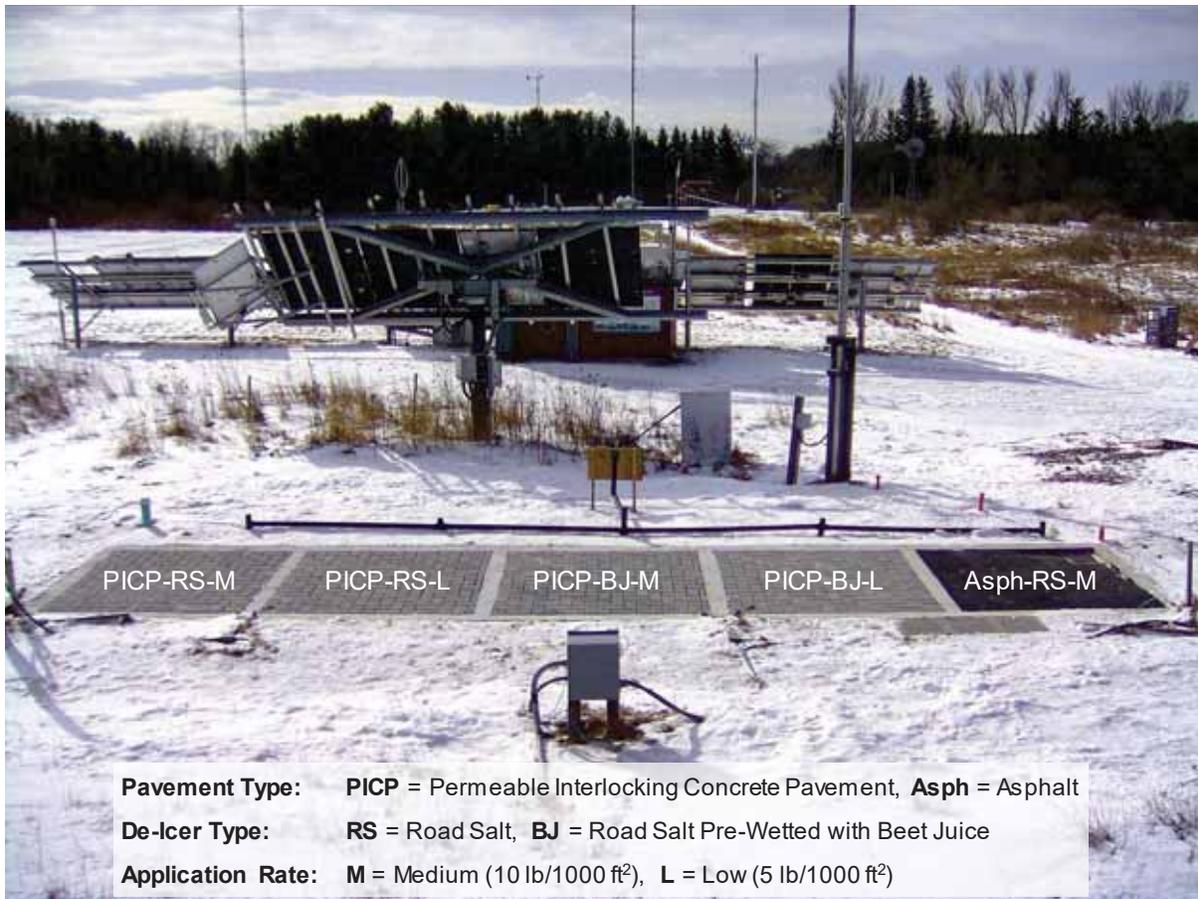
Surface layout of the outdoor pavement test site (facing south).
